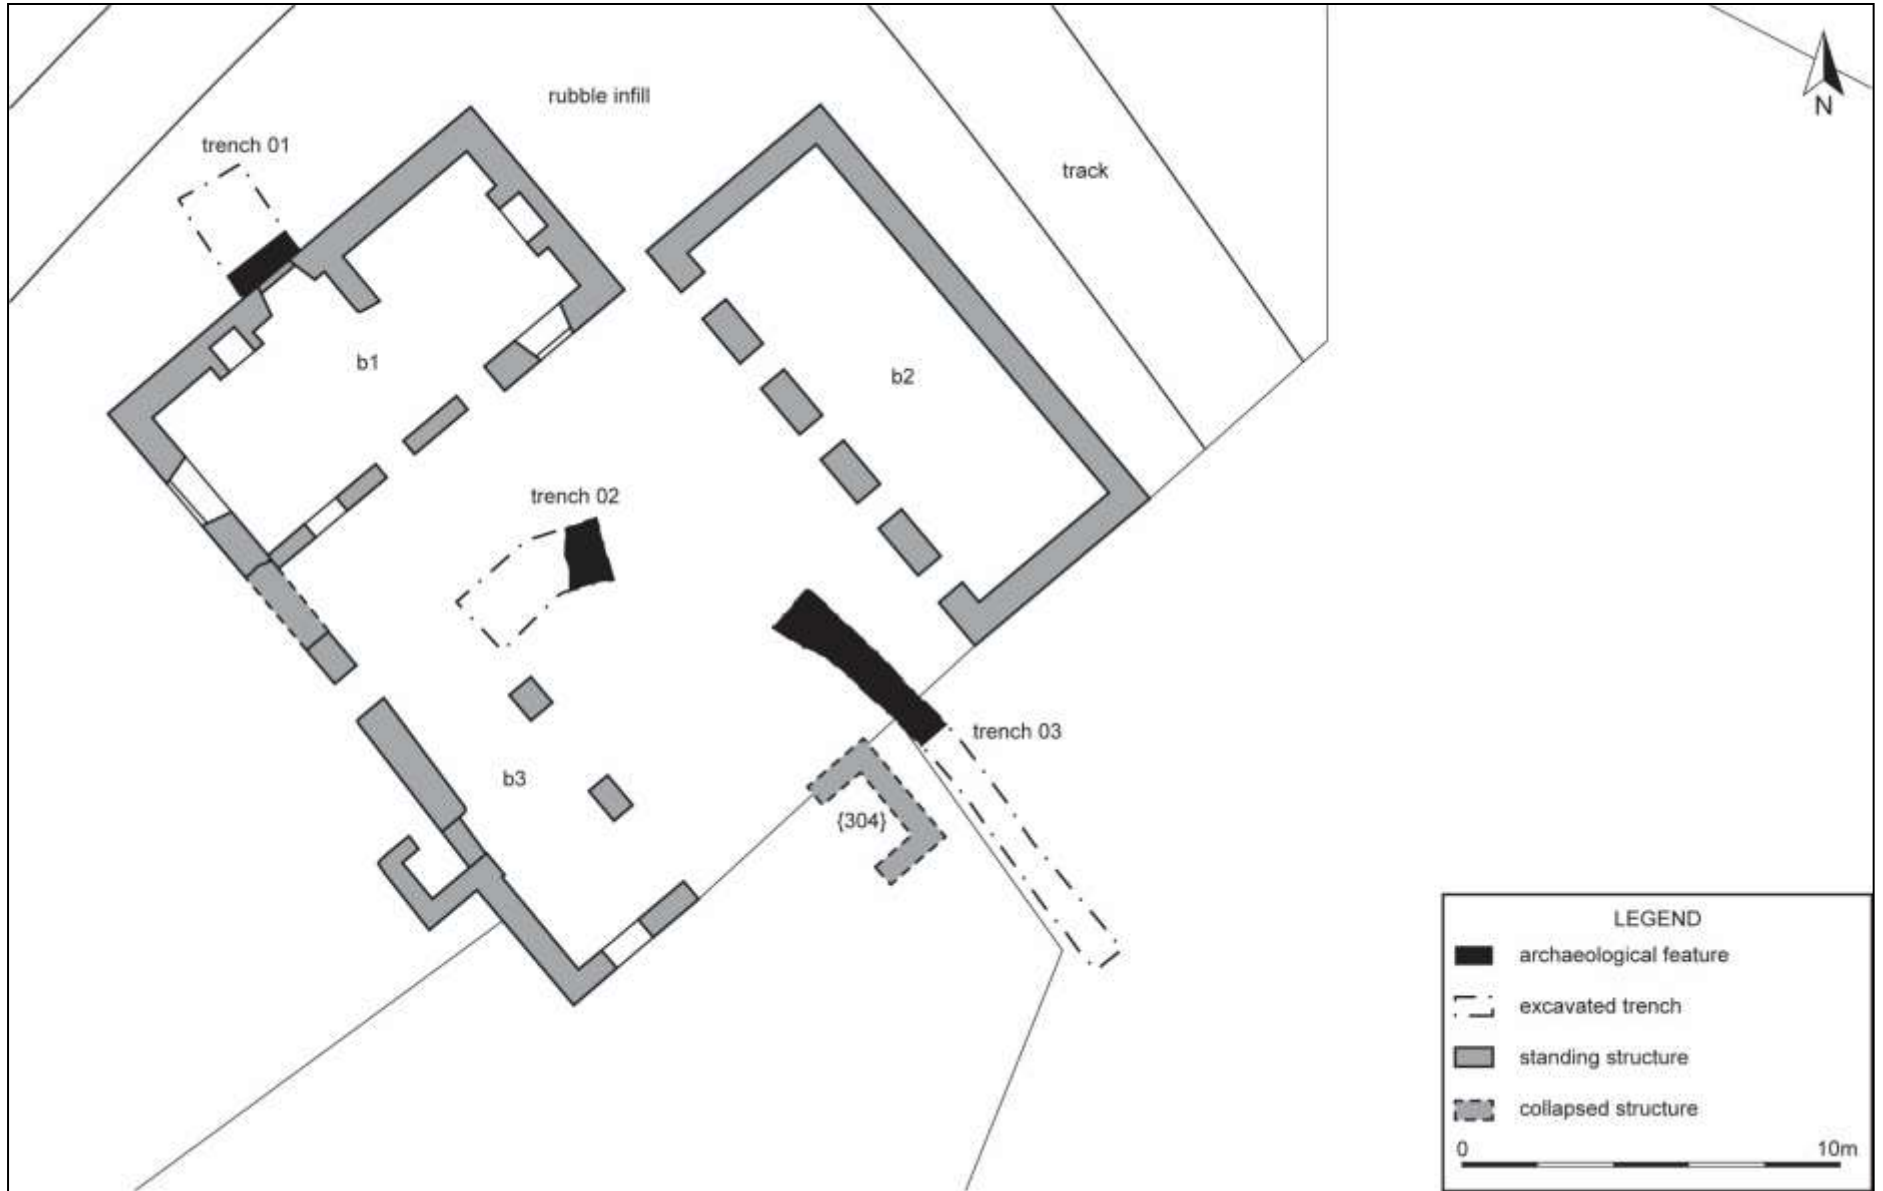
SITE PLAN SHOWING THE LOCATION OF THE BUILDINGS DISCUSSED AND EXCAVATED ARCHAEOLOGICAL TRENCHES.
